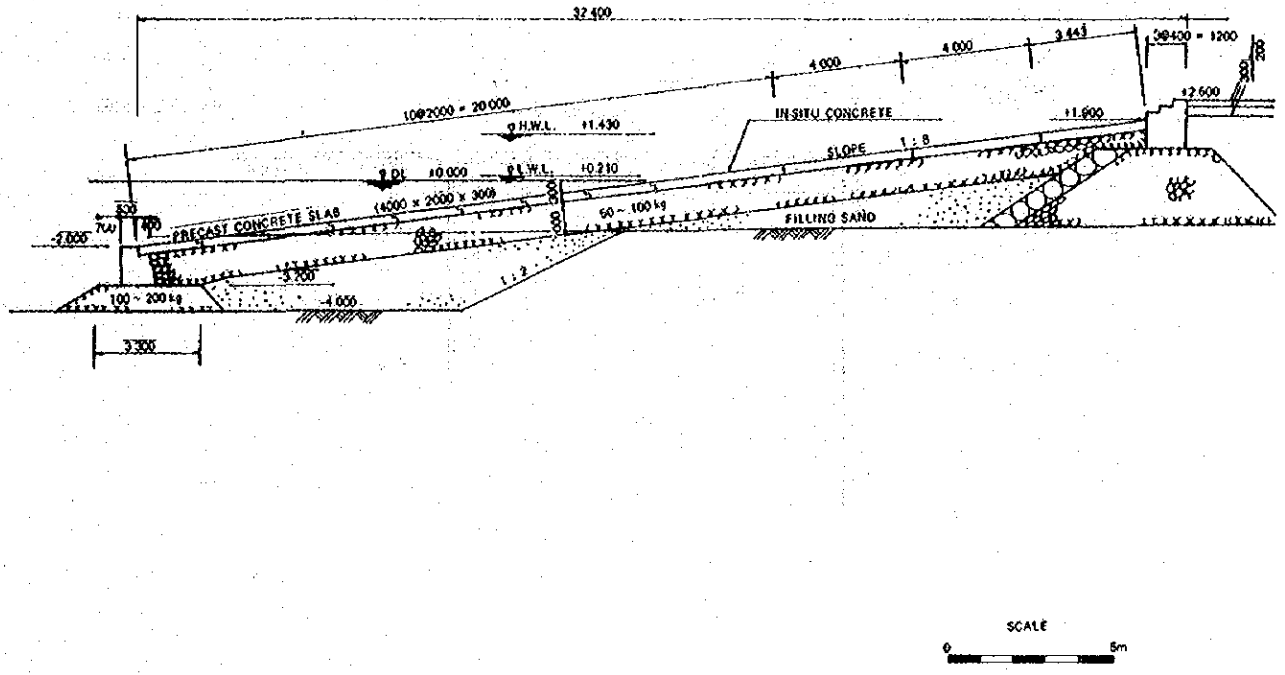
Cross Section of Stair Landing – Lucena Port
